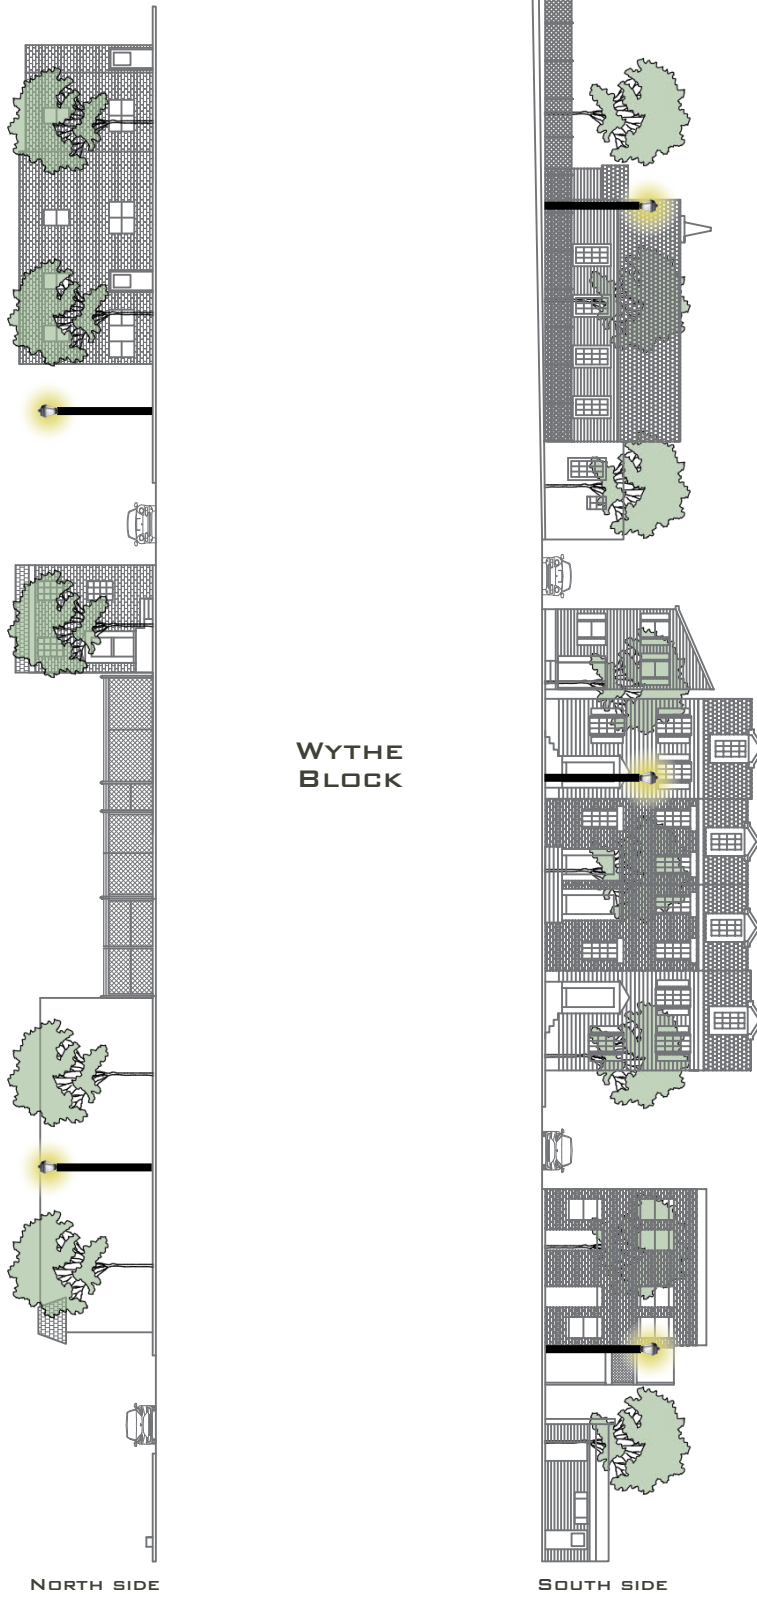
Example Scenario: Neighborhood Plan Design Guidelines, Concept Elevation. In an example scenario representing a straight application of the Braddock Metro Neighborhood Plan design guidelines, overhead utilities have been relocated underground. Street trees are evenly spaced and of the same species on each side of the block, and street lights are specified as pedestrian-scale Old Dominion Colonial fixtures.
